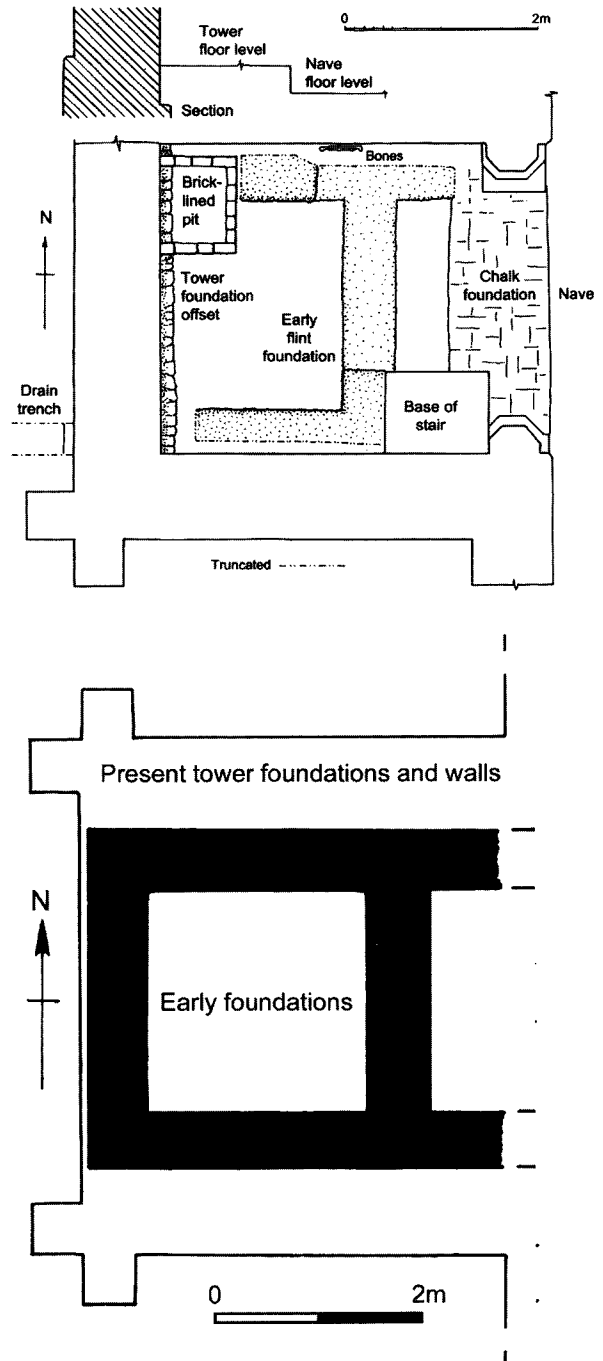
Stifford St. Mary, features found in the tower (top), and the early foundations reconstructed and related to the plan of the tower (bottom).
